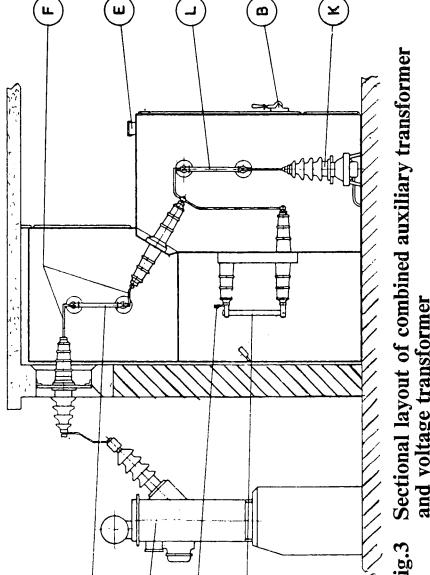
Sectional layout of combined auxiliary transformer and voltage transformer
